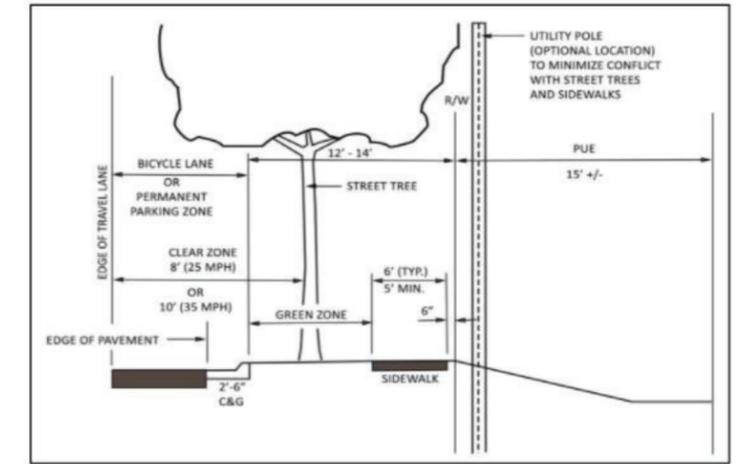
Recommended Green Zone and Sidewalk Zone (Complete Streets Planning and Design Guide)
